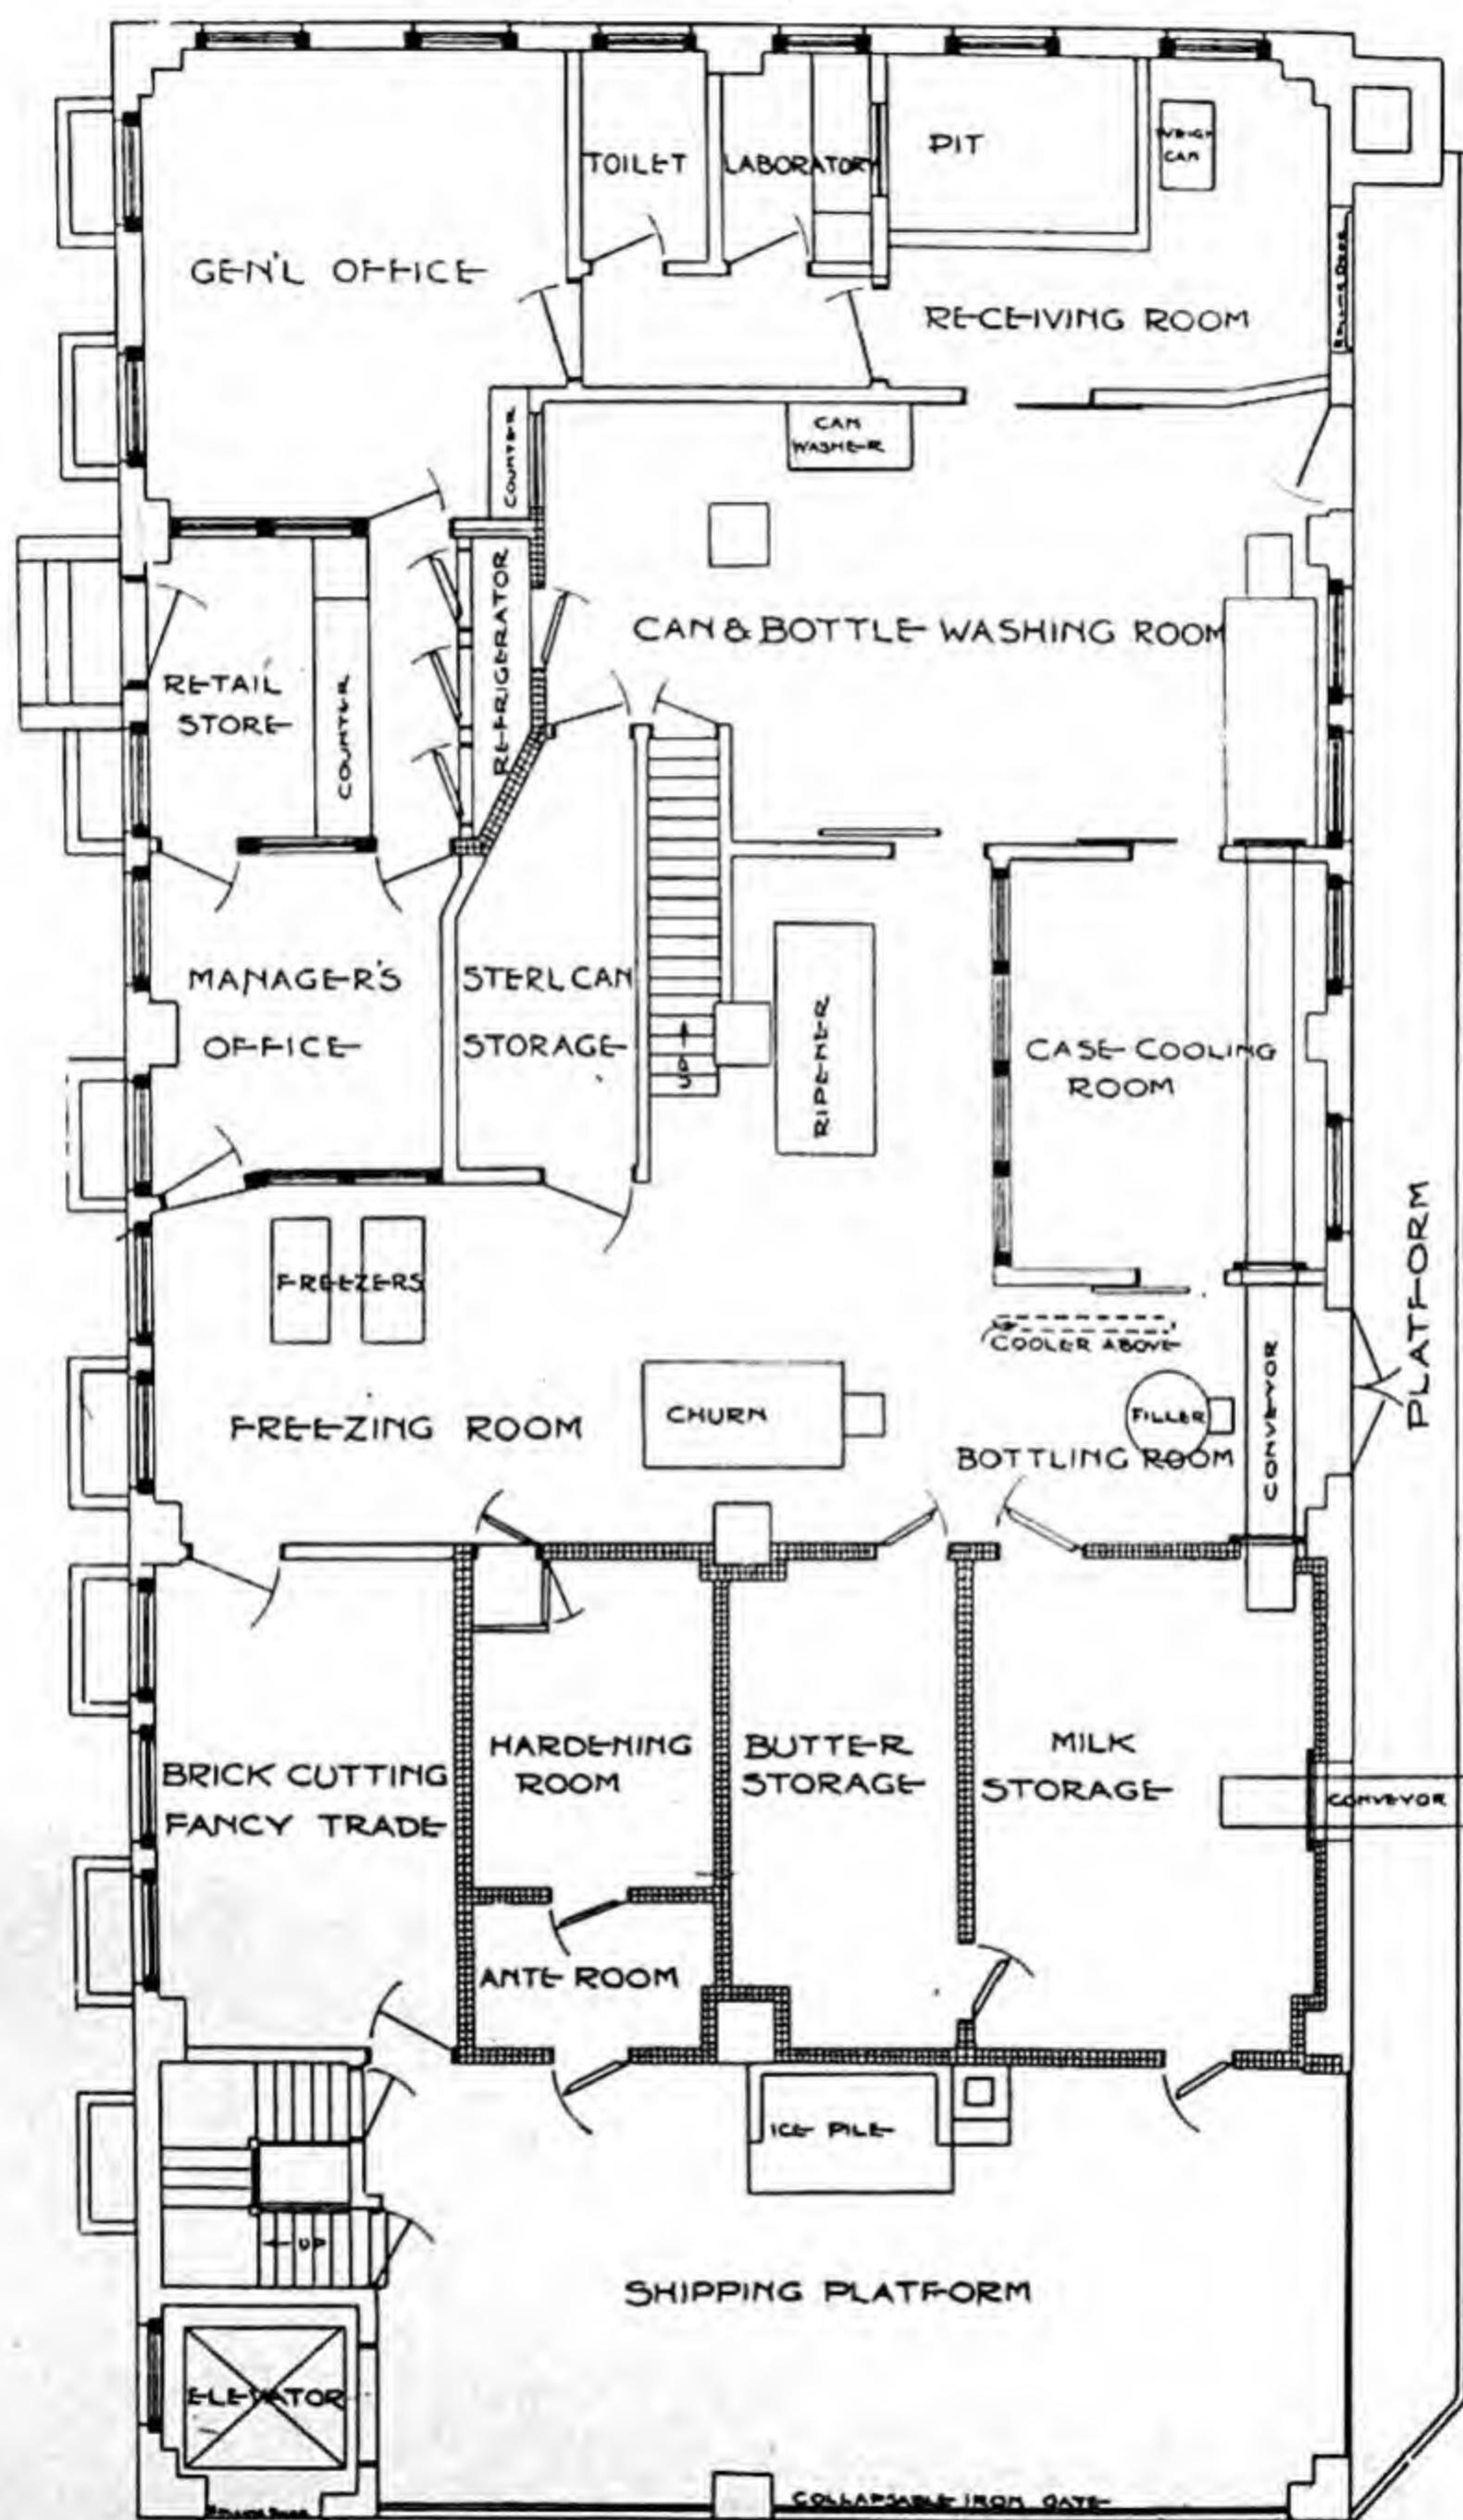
First Floor Plan of Typical Creamery and Dairy Plant.
